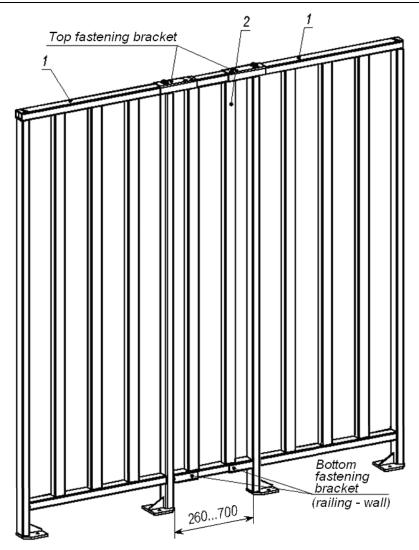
Sample design of the railings: 1 – MB-15R railings; 2 – MB-15D extension section.
